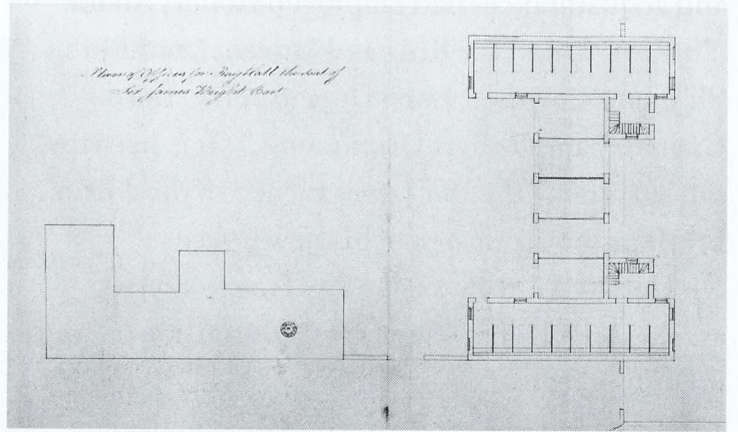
Robert Adam, ground floor plan, proposed stable, Ray Hall, c.1773. *Sir John Soane's Museum.
